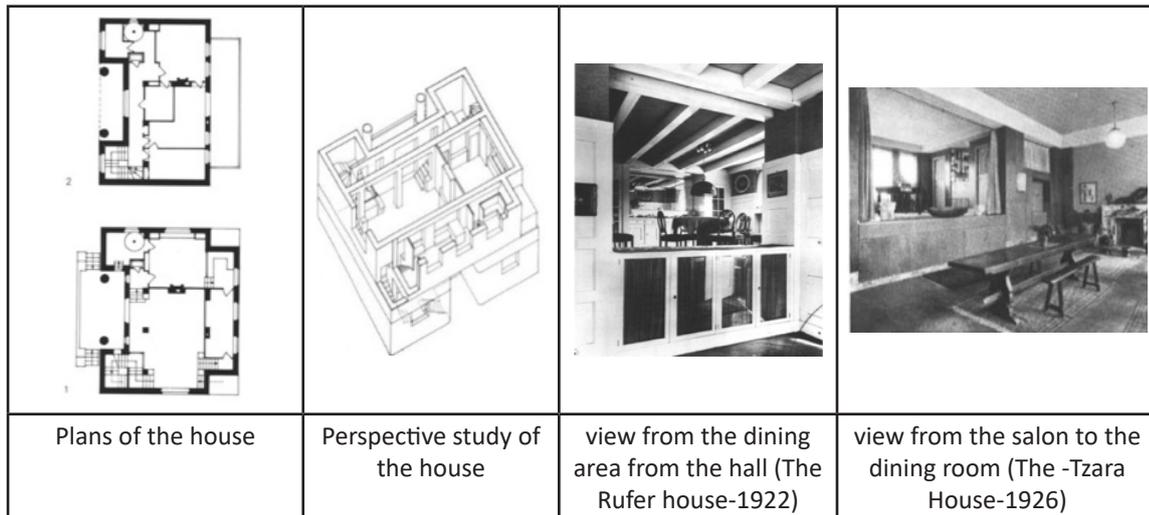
Raumplan \_new spatial structure presentation with drawings and photographs
